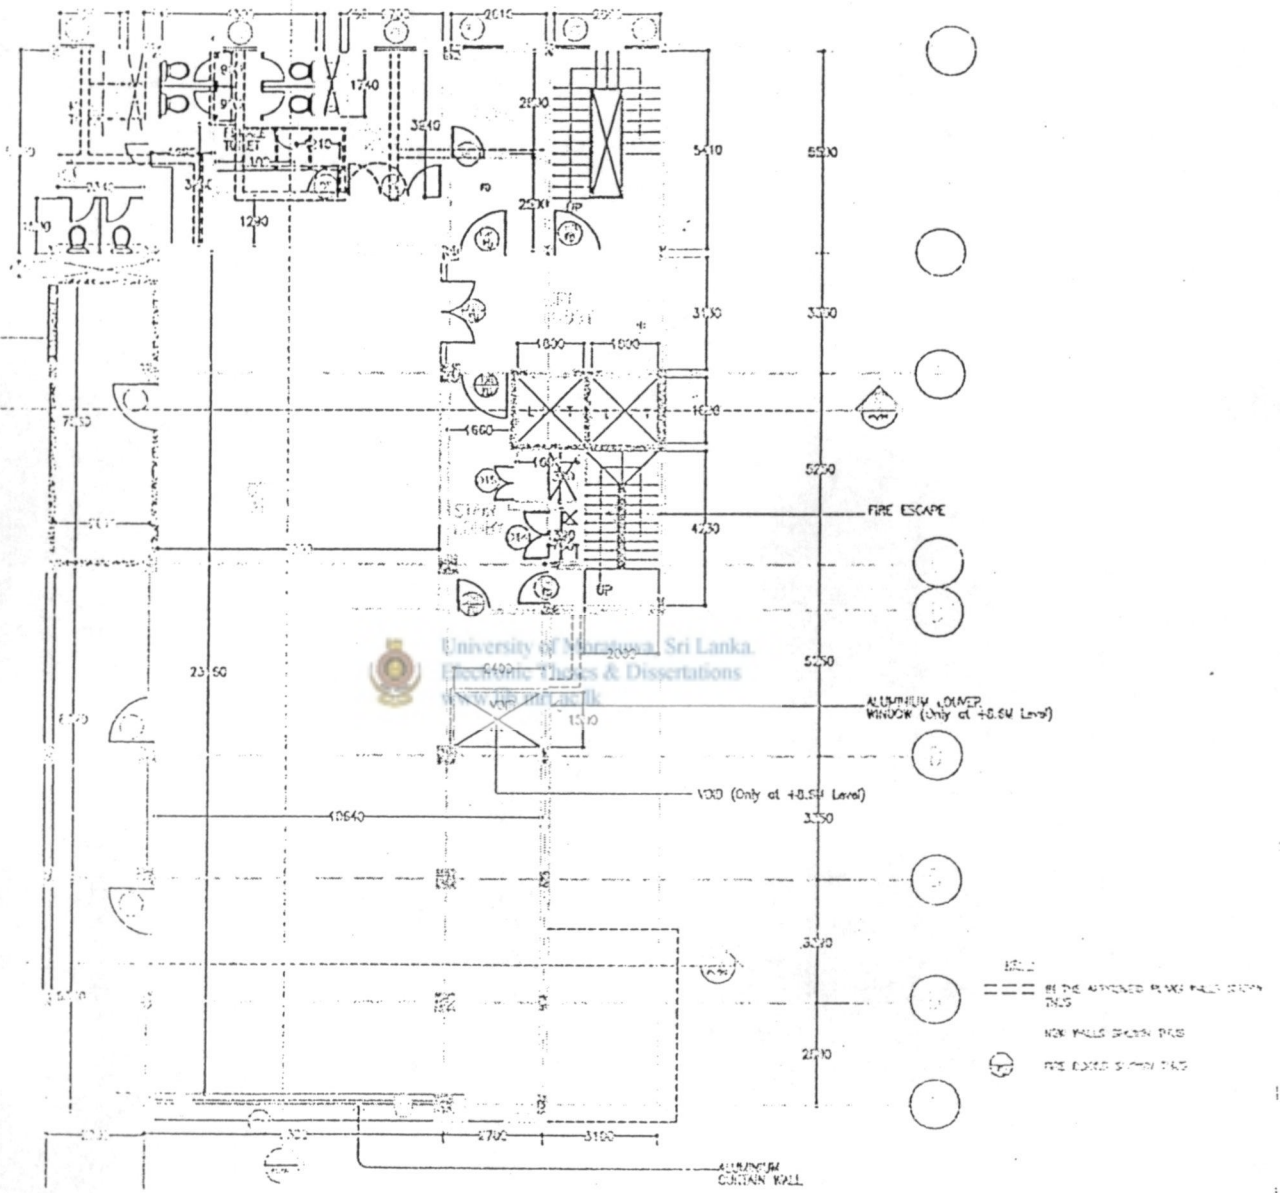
First Floor Plan of Air Conditioned Office Building
